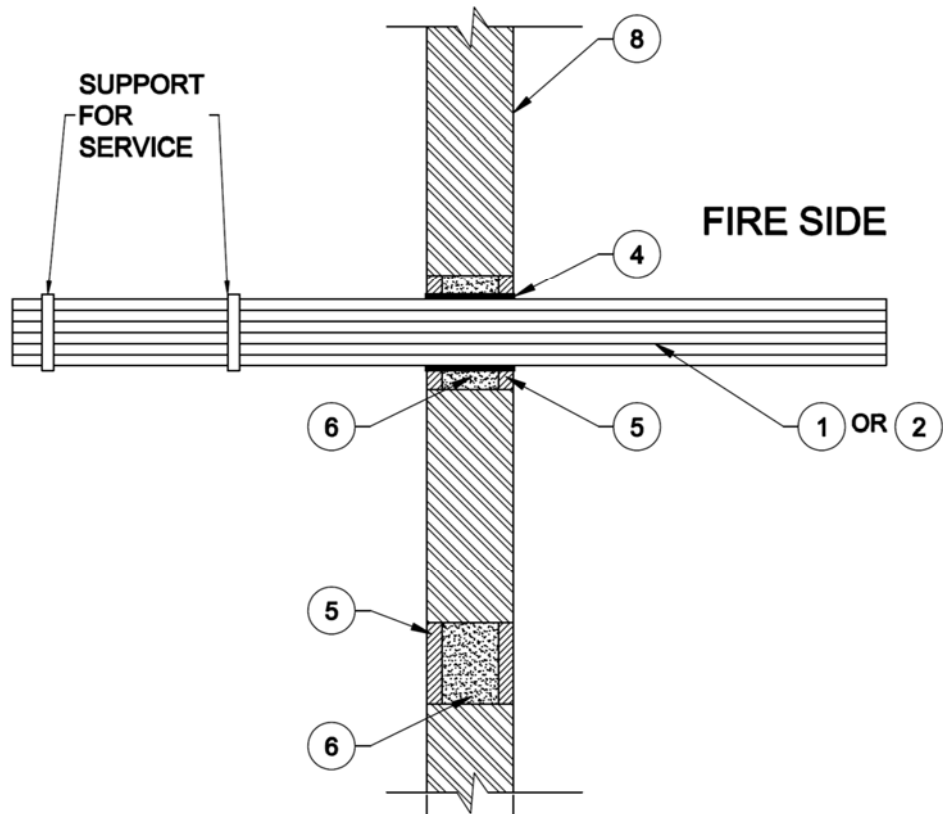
Typical details for unwrapped cables and blank penetration seals in masonry walls
